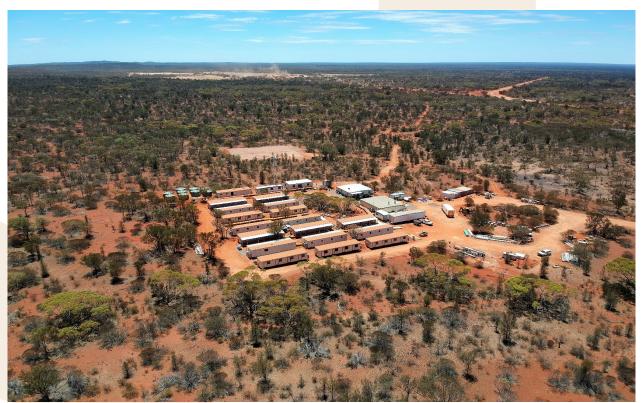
New 64 bed camp under construction at Riverina. Note mine in background.
